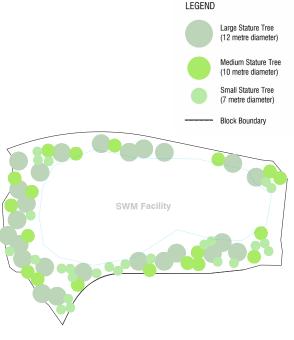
Storm Water Management Facility Conceptual Tree Canopy Coverage Plan
